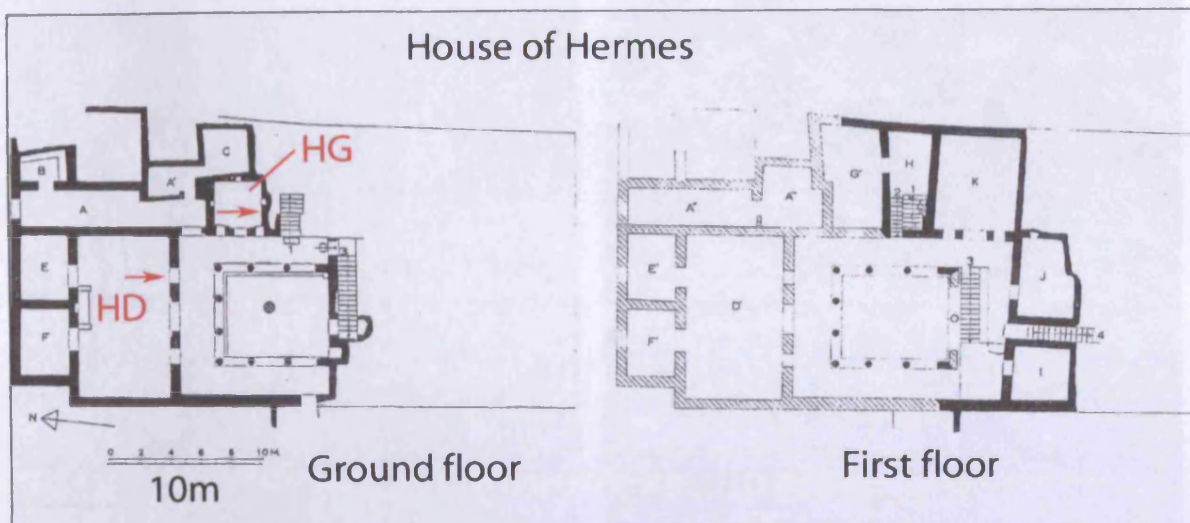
House of Hermes ground plan. Red arrows mark sampling locations
